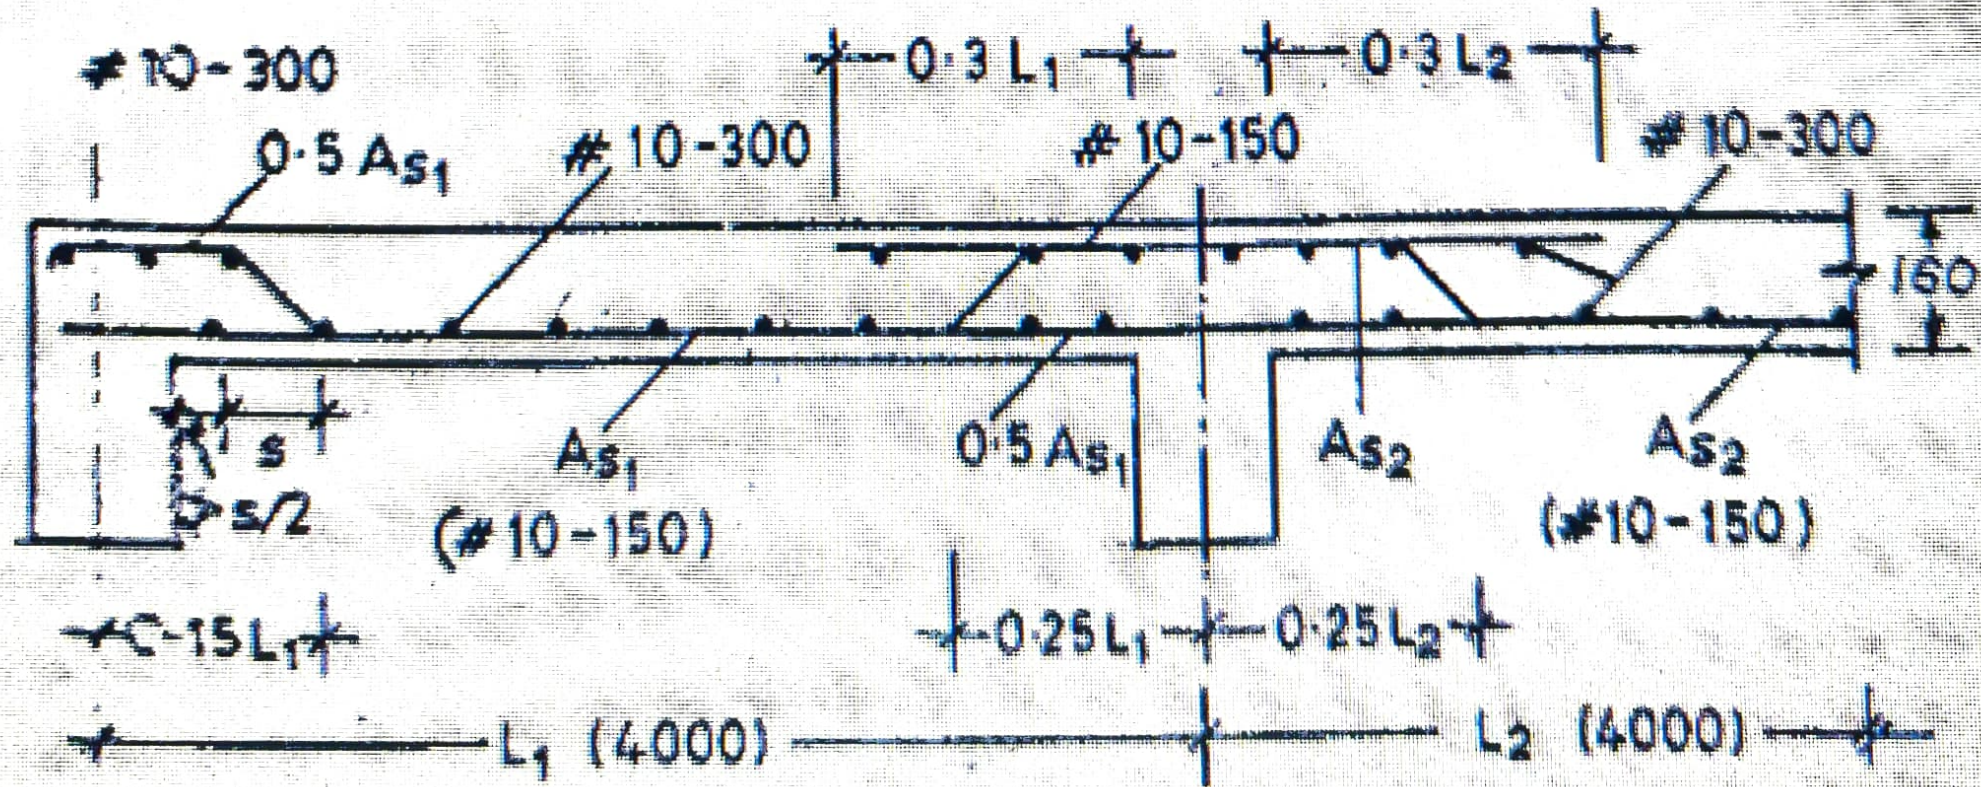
Reinforcement Details in One Way Continuous Slab
